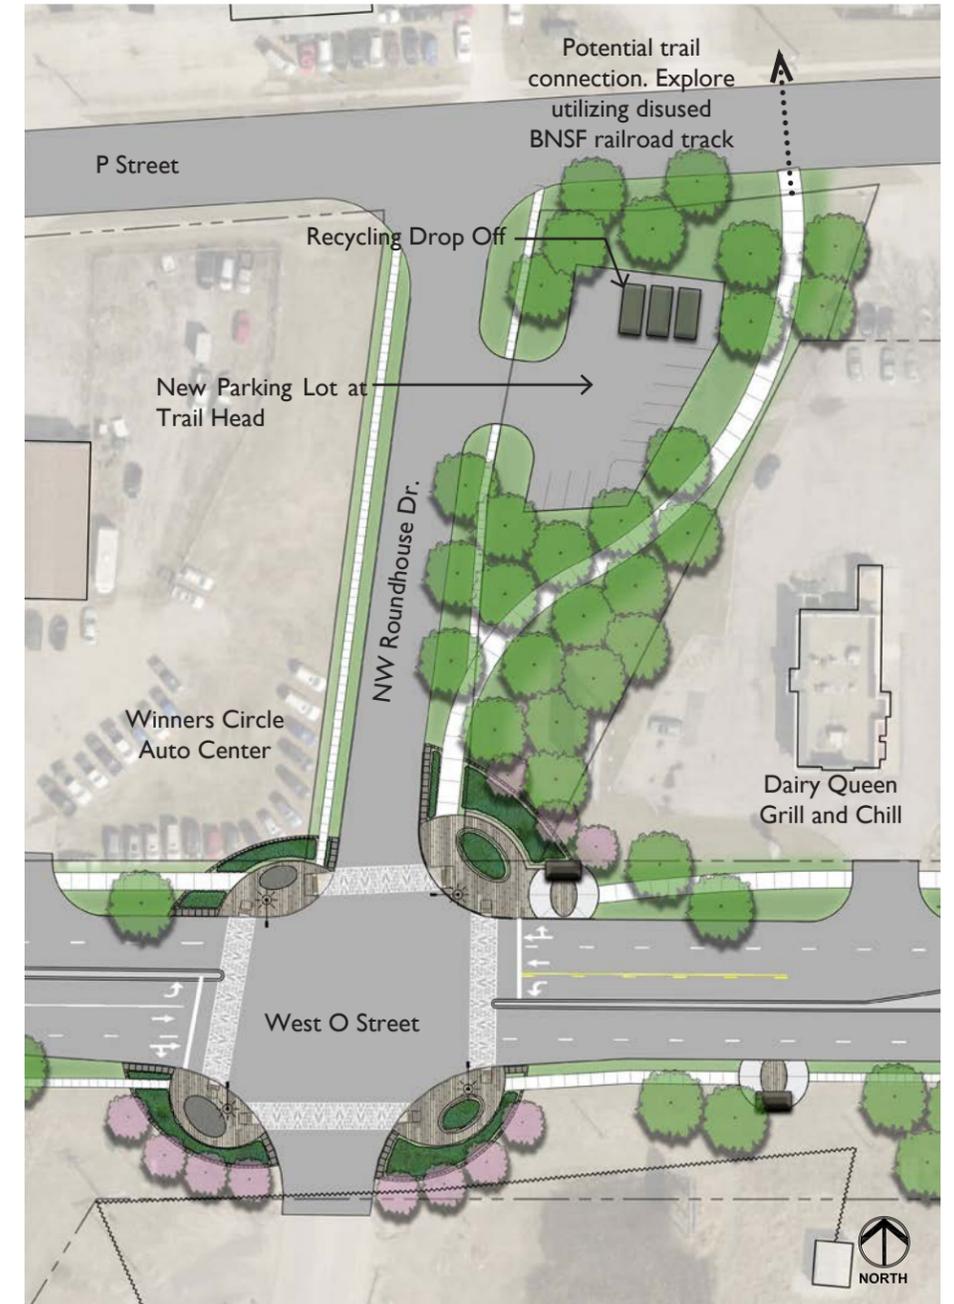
Trailhead at NW Roundhouse Boulevard
